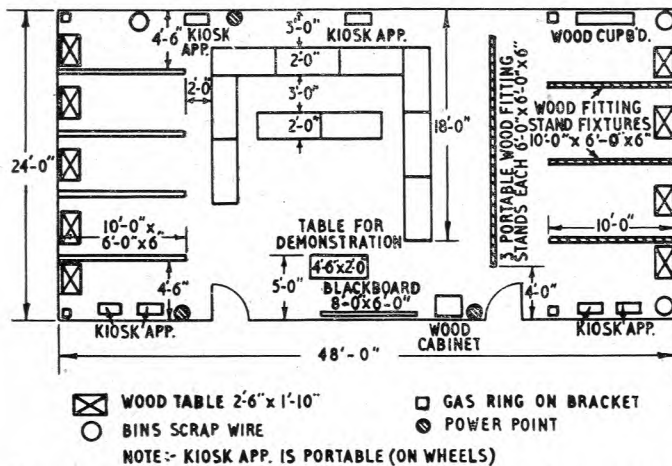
LAYOUT OF PRACTICAL ROOM (SUBSCRIBERS' APPARATUS FITTING).
